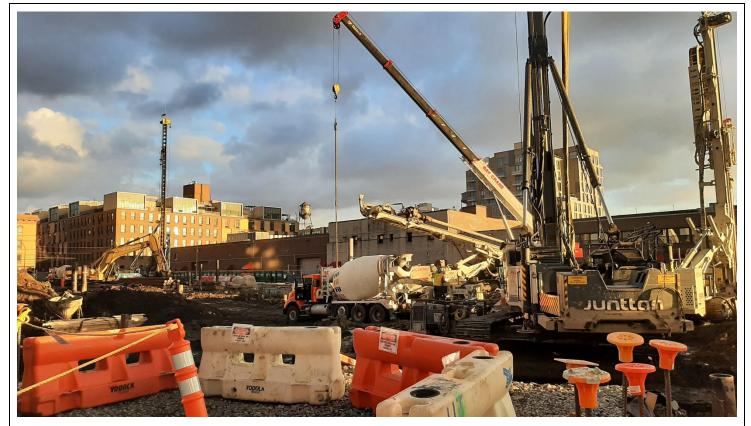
View facing southeast, CCJV filling caissons with cement and installing rebar.
